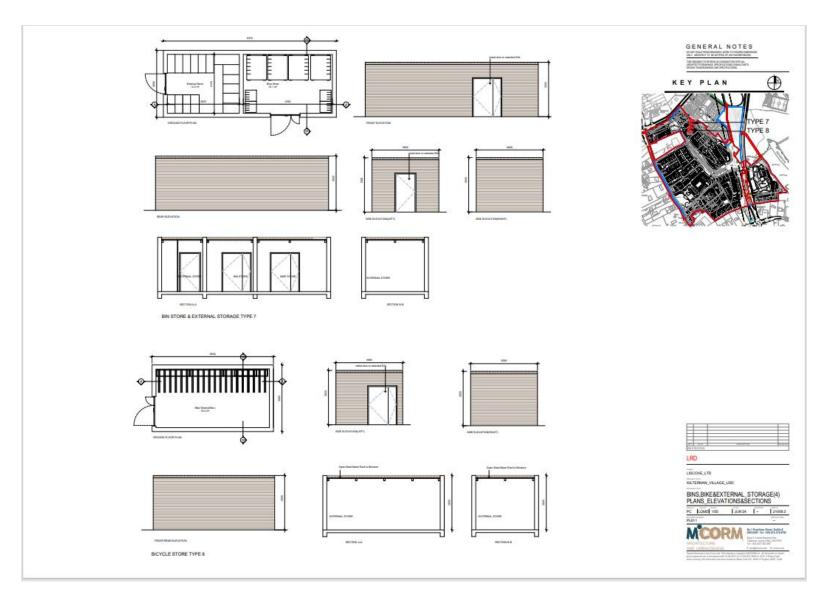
Internal Layout of Waste Storage Area Type 7 and 8
